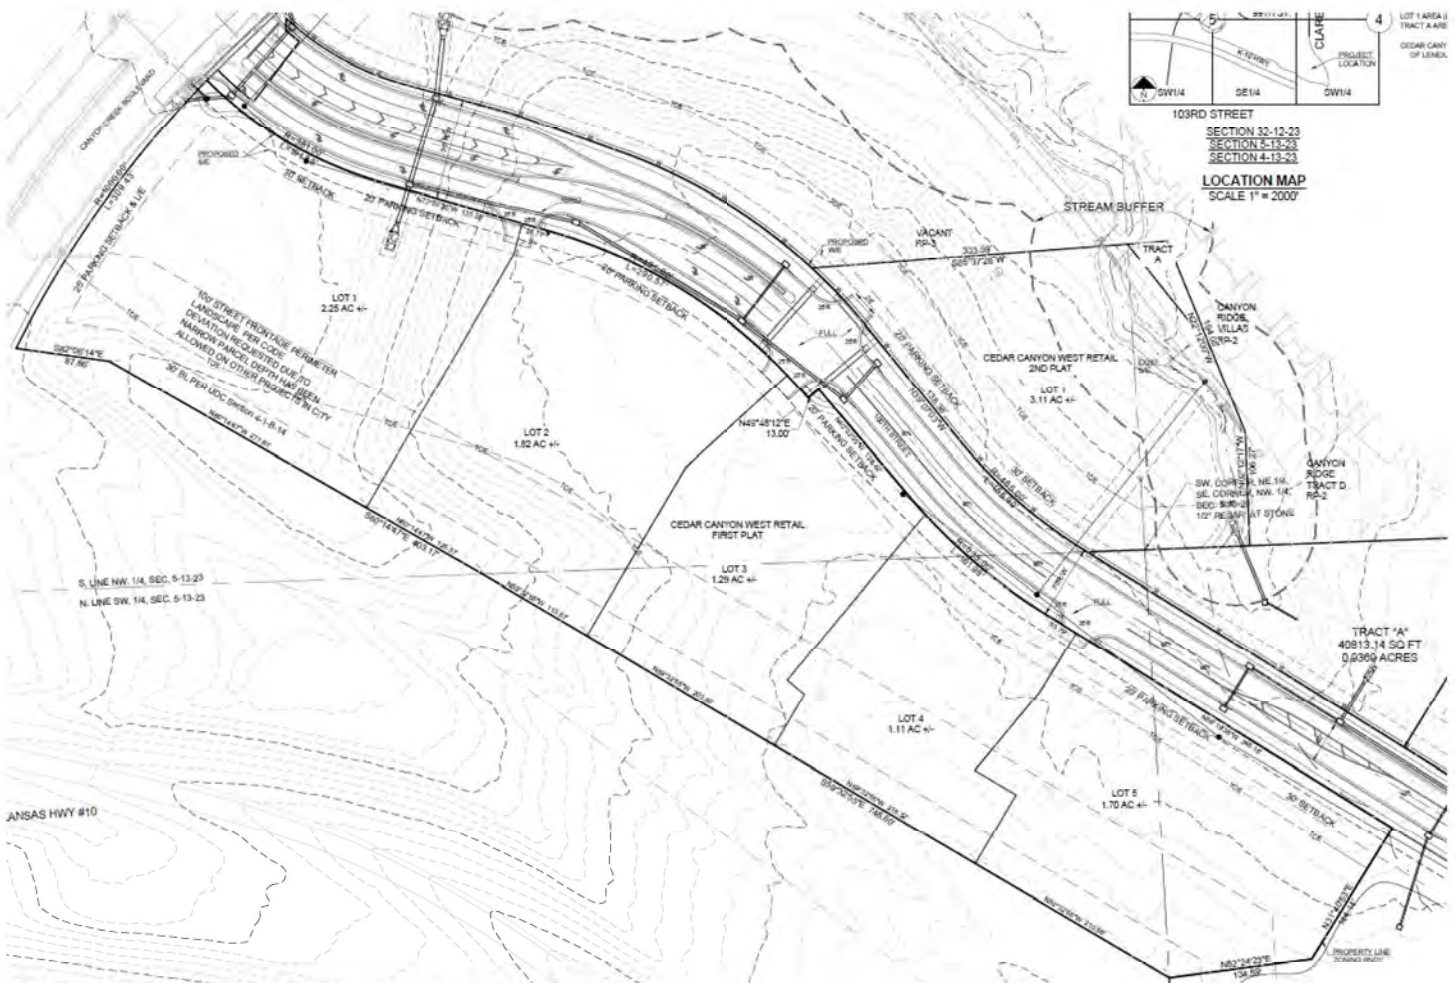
Excerpt of the Proposed Preliminary Plat.
